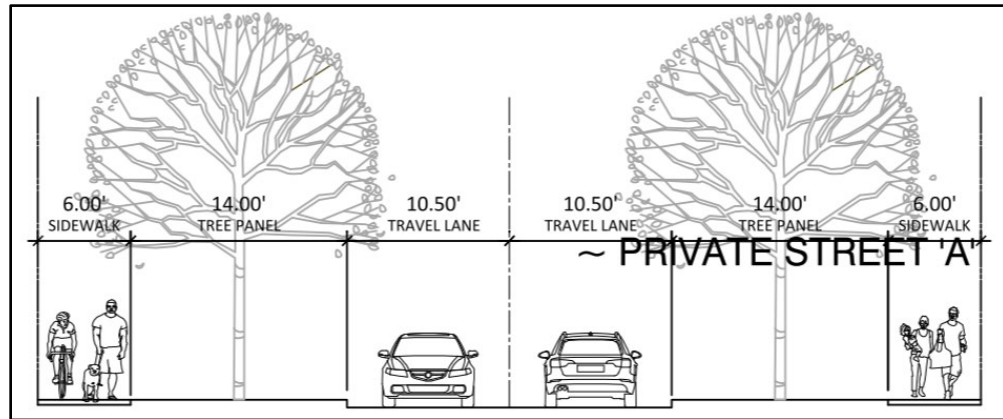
Proposed Cross-Section for Pink Segment of Street A, as conditioned.
